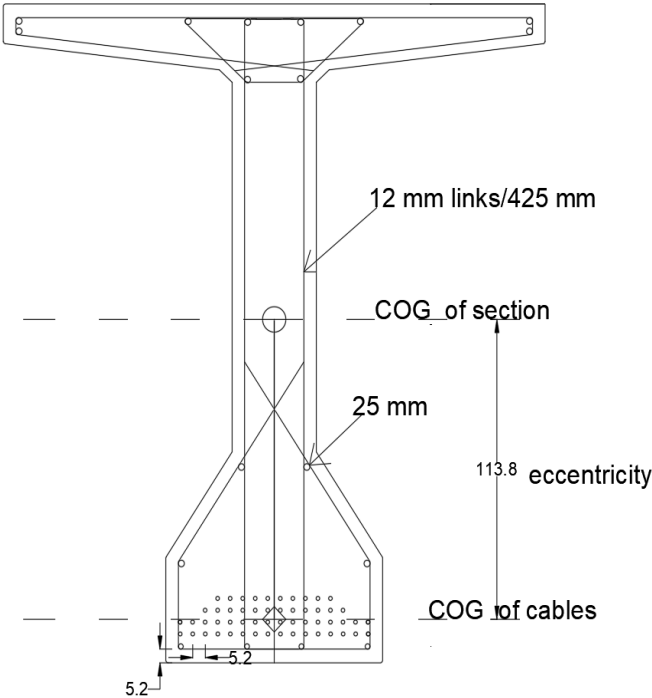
Detailed section of precast beam at midspan for the Eurocode Design
